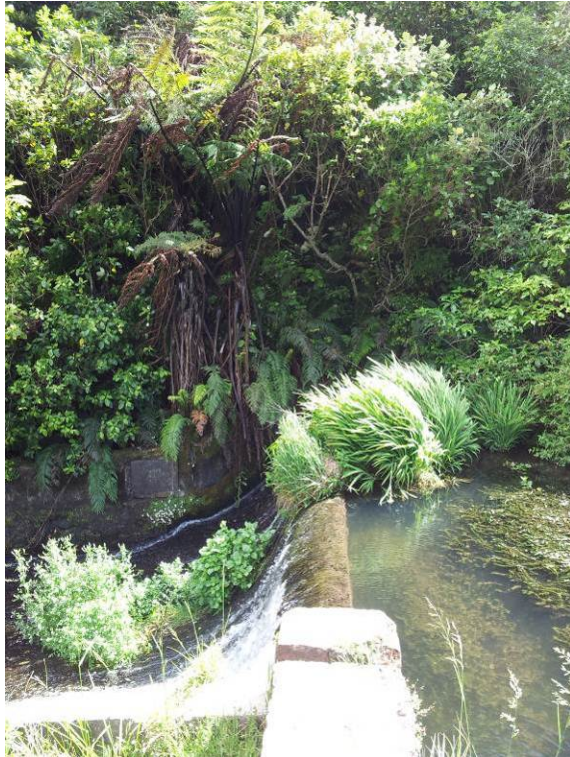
Korokoro Dam spillway crest and right abutment. Note vegetation in spillway chute and on abutment.
